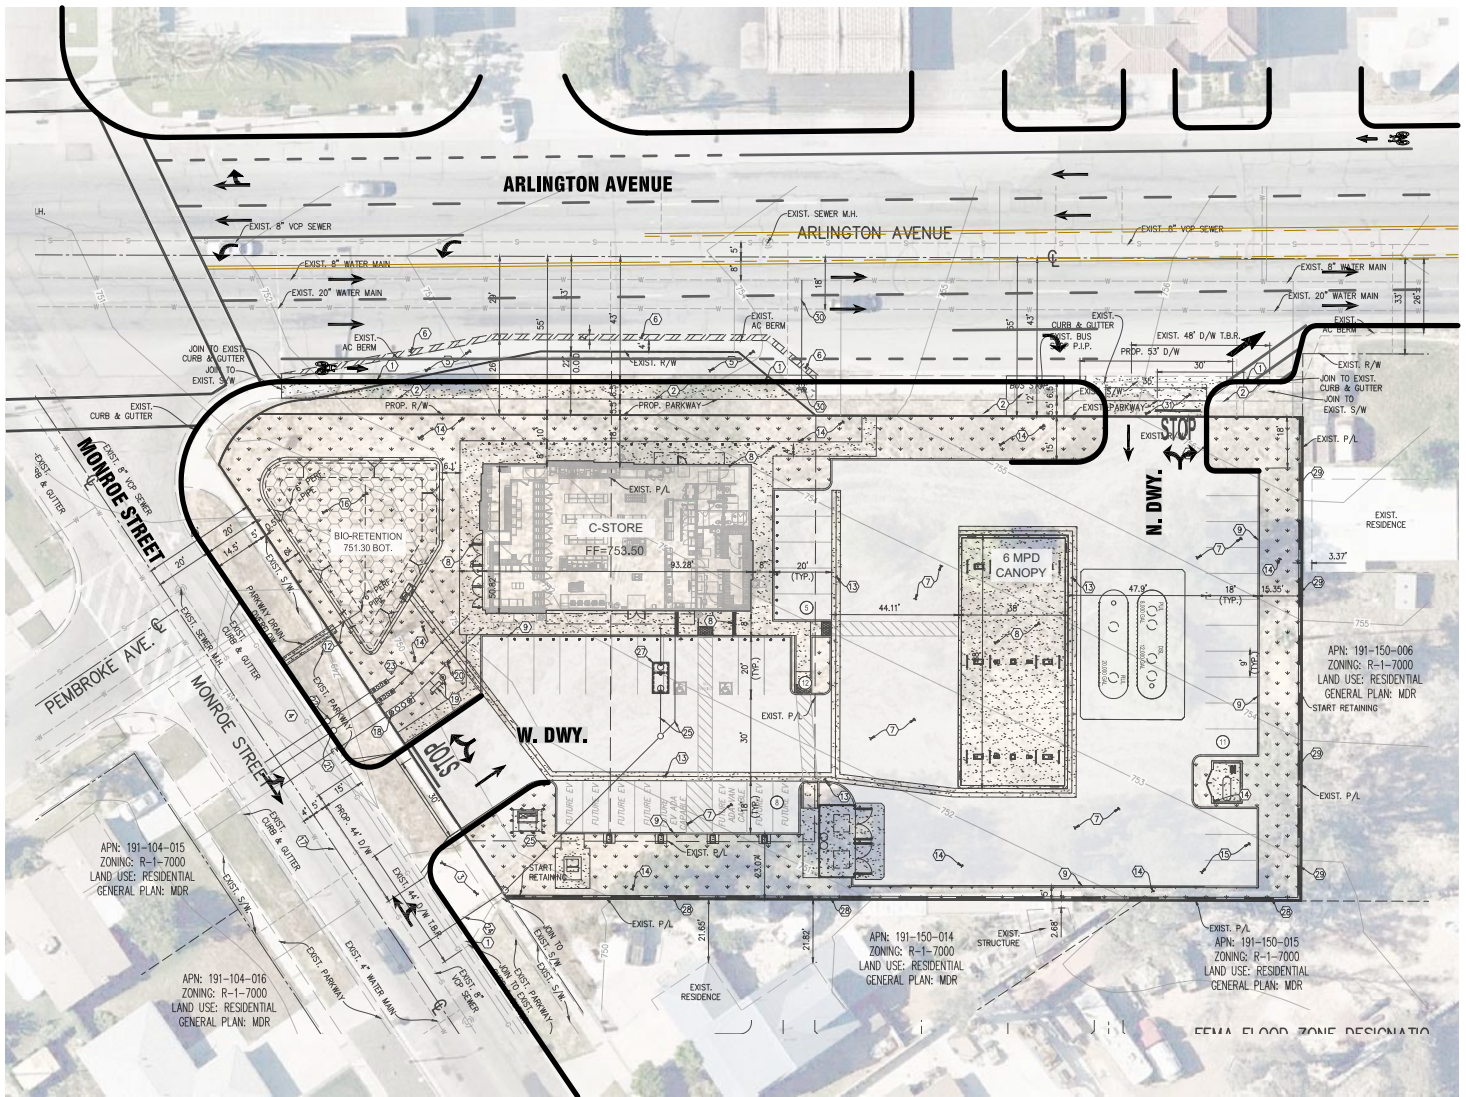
B illustrates the on-site recommended roadway and intersection lane improvements with right-in/right-out only access restriction at the N. Project Driveway due to the future median improvement project on the east side of Monroe Street/Arlington Avenue intersection, per DRC meeting.
